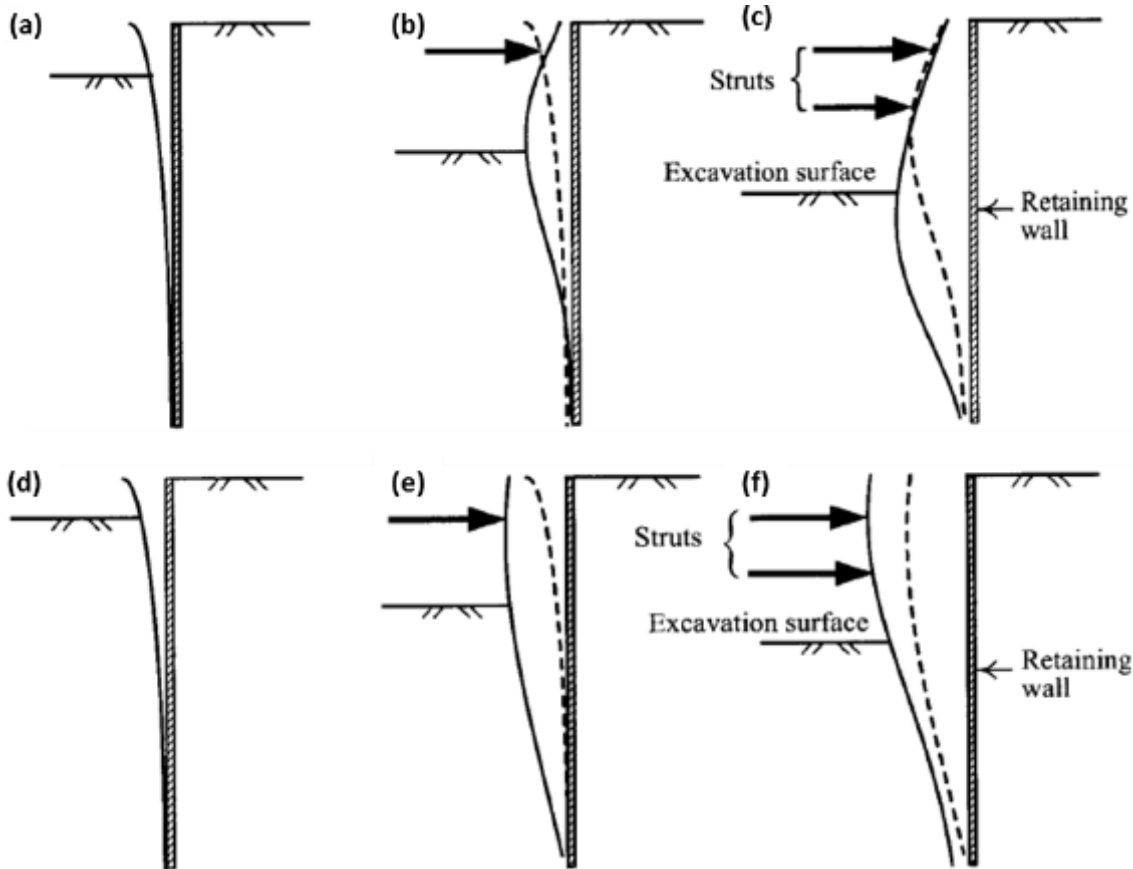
Difference between braced excavations with high stiffness struts (a) first stage of excavation, (b) second stage of excavation, (c) third excavation level and with low stiffness struts (d) first stage of excavation, (e) second stage of excavation (f) final stage of excavation. After (Ou 2006).
